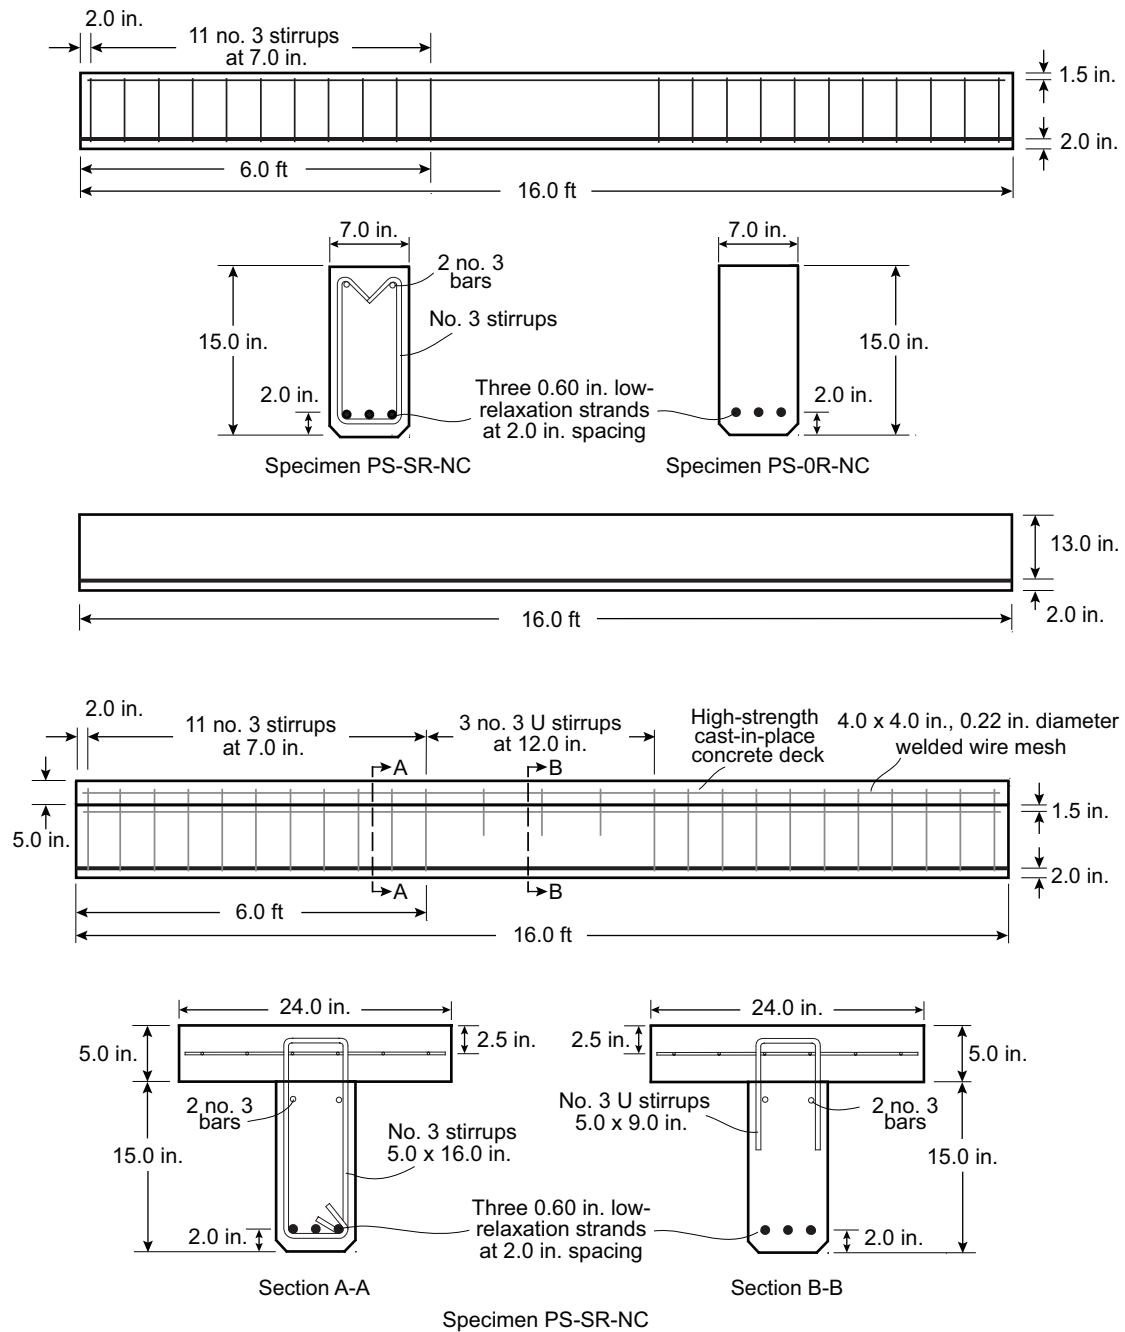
Prestressed concrete beam details. Note: no. 3 = 10M; 1 in. = 25.4 mm; 1 ft = 0.305 m.
